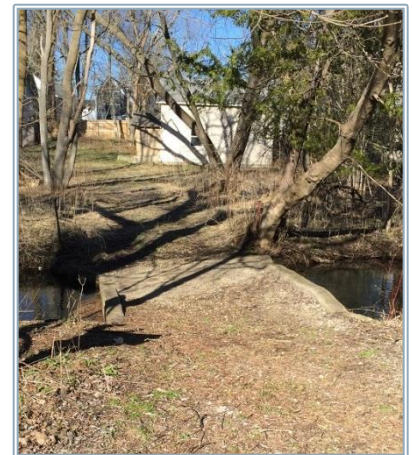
Private crossing between Cedar Street crossings (note that the bridge is at and also below top of bank)
